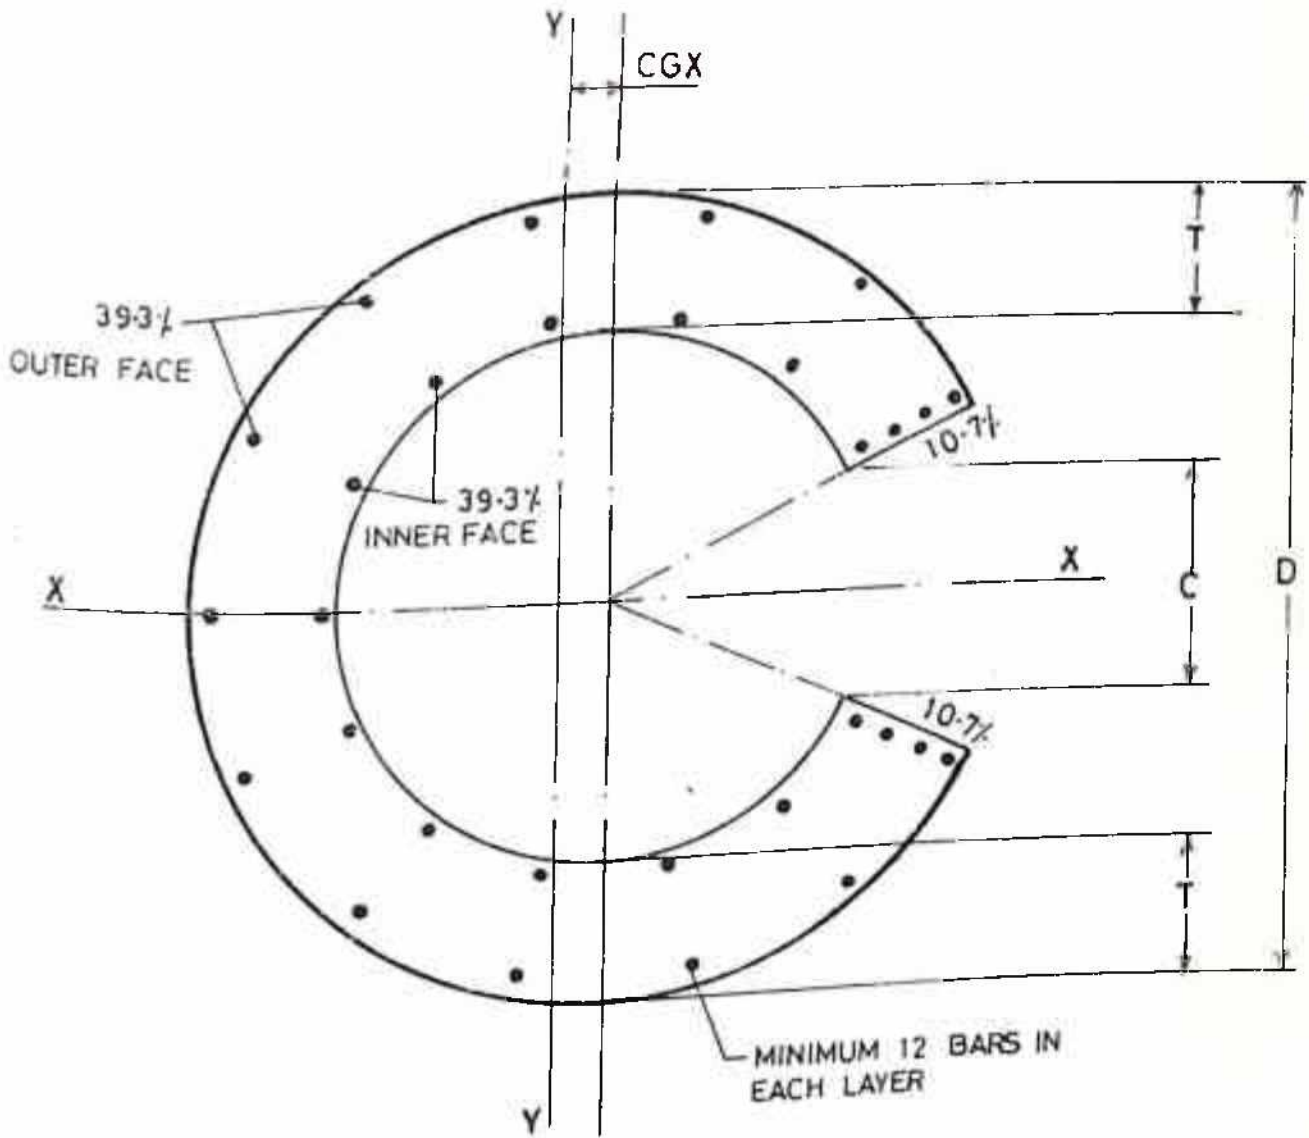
OPTIMUM REINFORCEMENT ARRANGEMENT FOR CIRCULAR CEE COLUMNS
